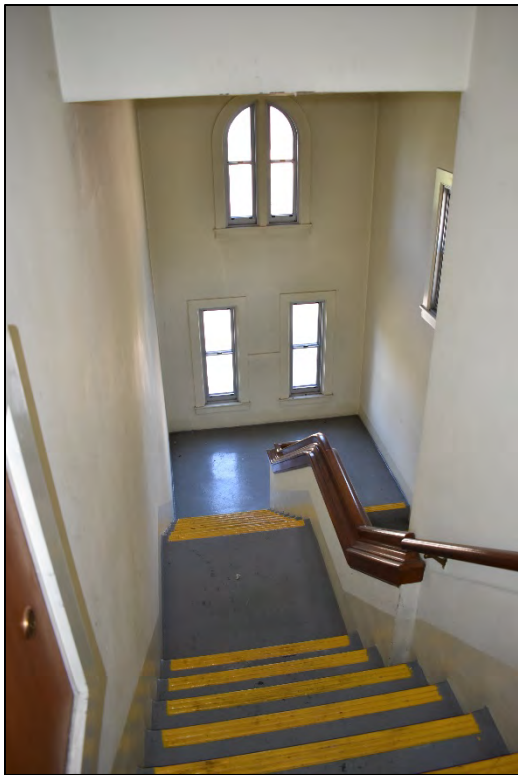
Main Building, interior, second floor, dormitory behind chapel/auditorium, northeast exit stair.
